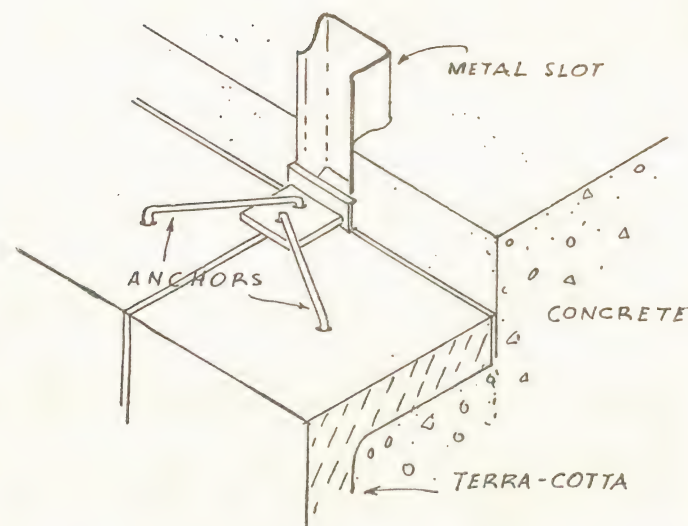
Patent fixing slots and anchors for fixing masonry facing to concrete backing.
